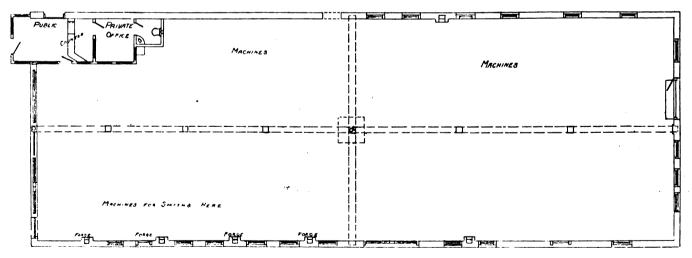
SHOWING THE FLOOR PLAN OF THE NEW SHOP
